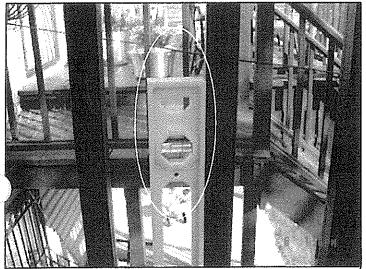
Overflow located at access pit. Material appears to be PVC and not cast iron as stated on building plans.
